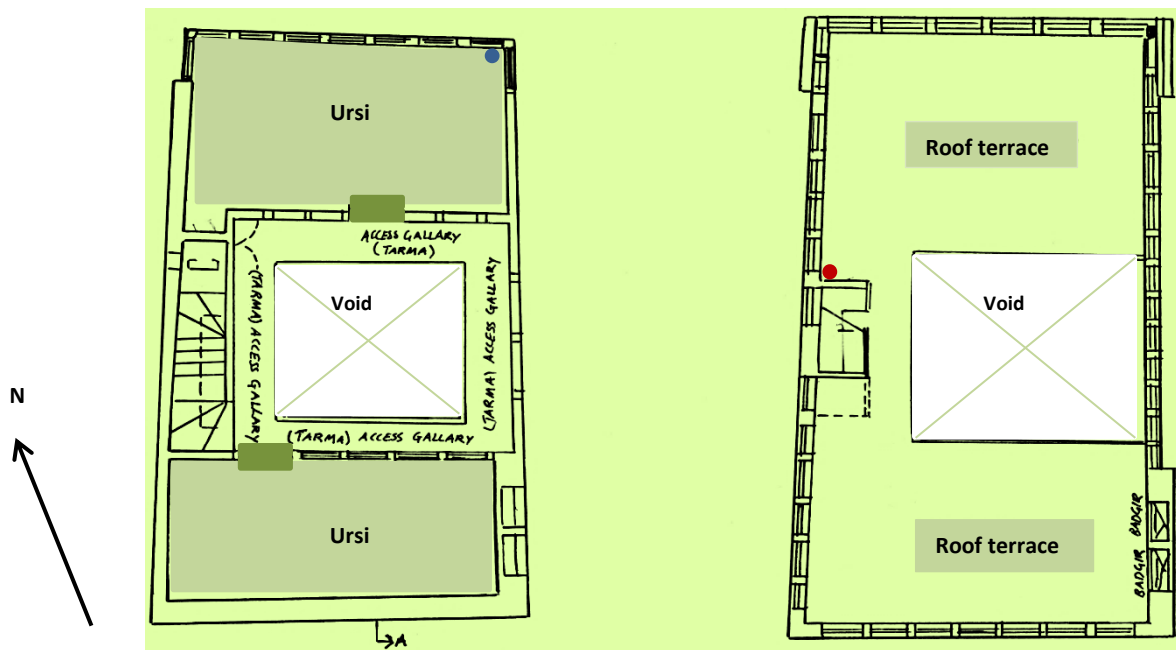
First floor level plan and roof terrace level plan (Researcher) Scale: 1:50
